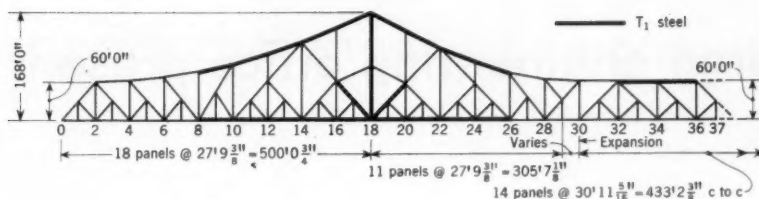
On truss outline, members fabricated from high-strength T1 steel are indicated. Other members are of A 242 steel except those carrying lightest loads, which are of A 7.
